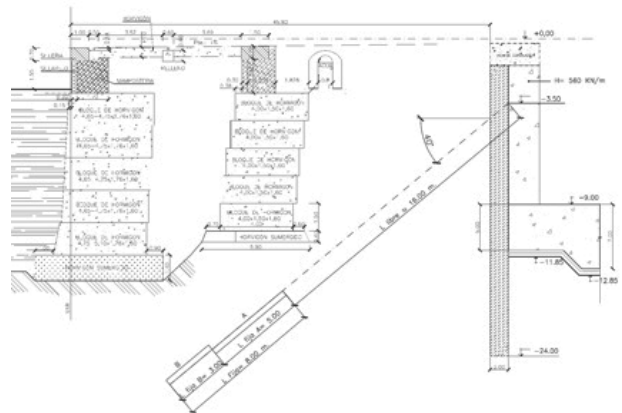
Section of port zone. Diaphragm wall with trial anchor.
